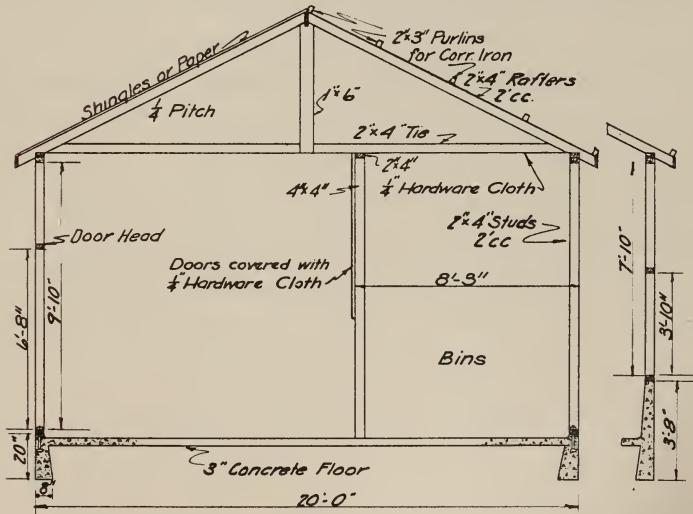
Cross section of feed storage and egg room shown in figure 56.
